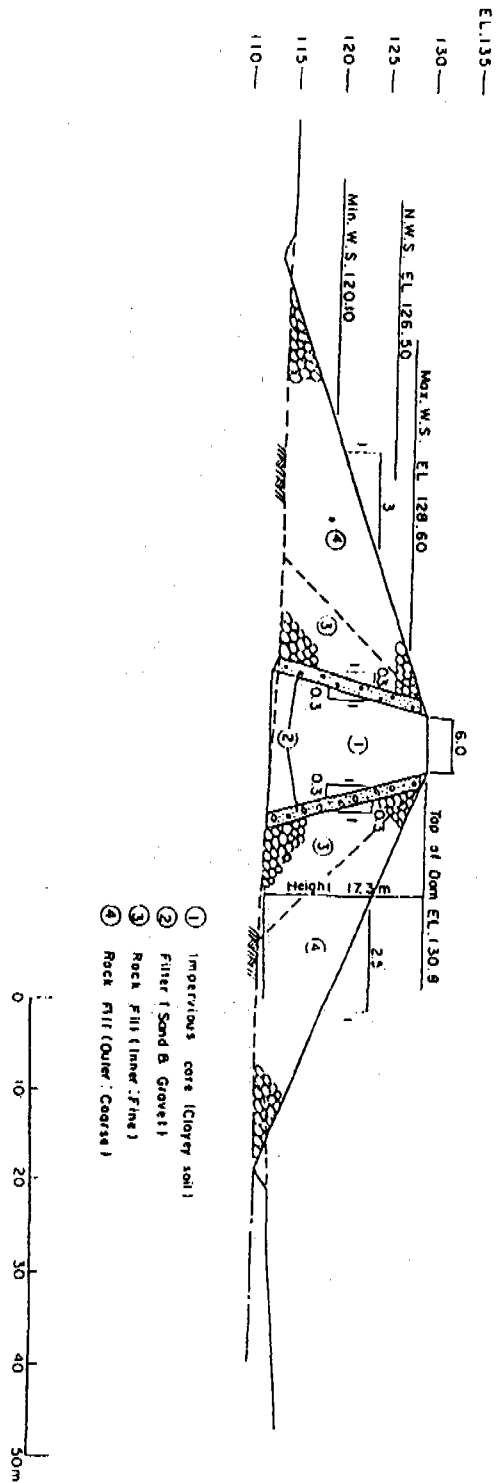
TYPICAL SECTION OF PANGASAN DAM
